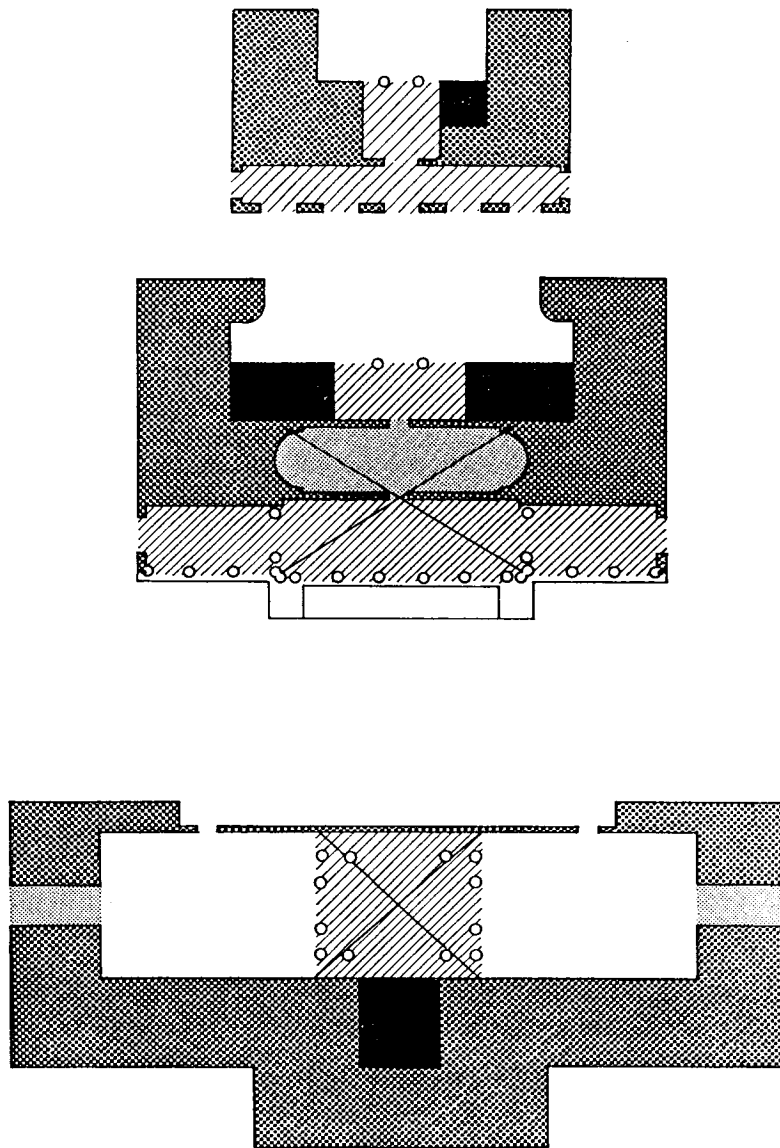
Plan type "A" (Palladio): palazzi Civena, Chiericati, Della Torre
